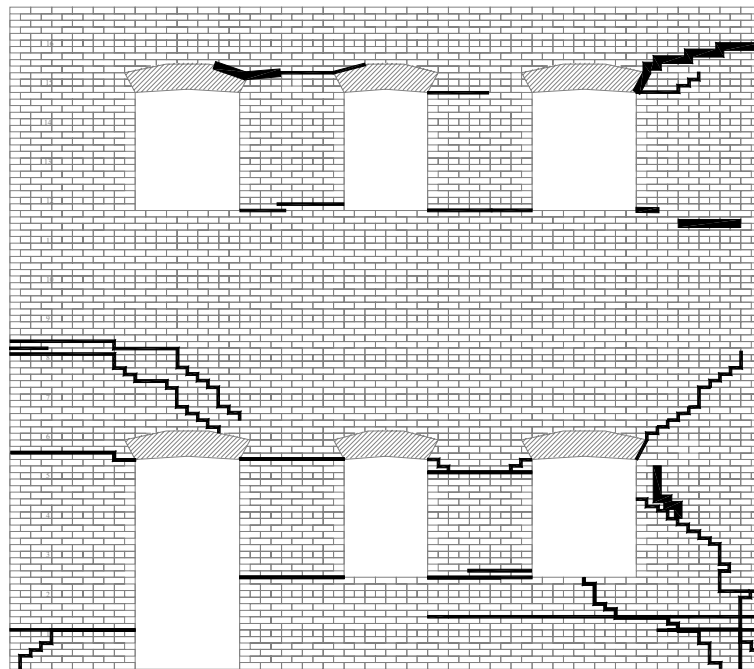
Crack pattern of Wall B following the Group 2 cycles
